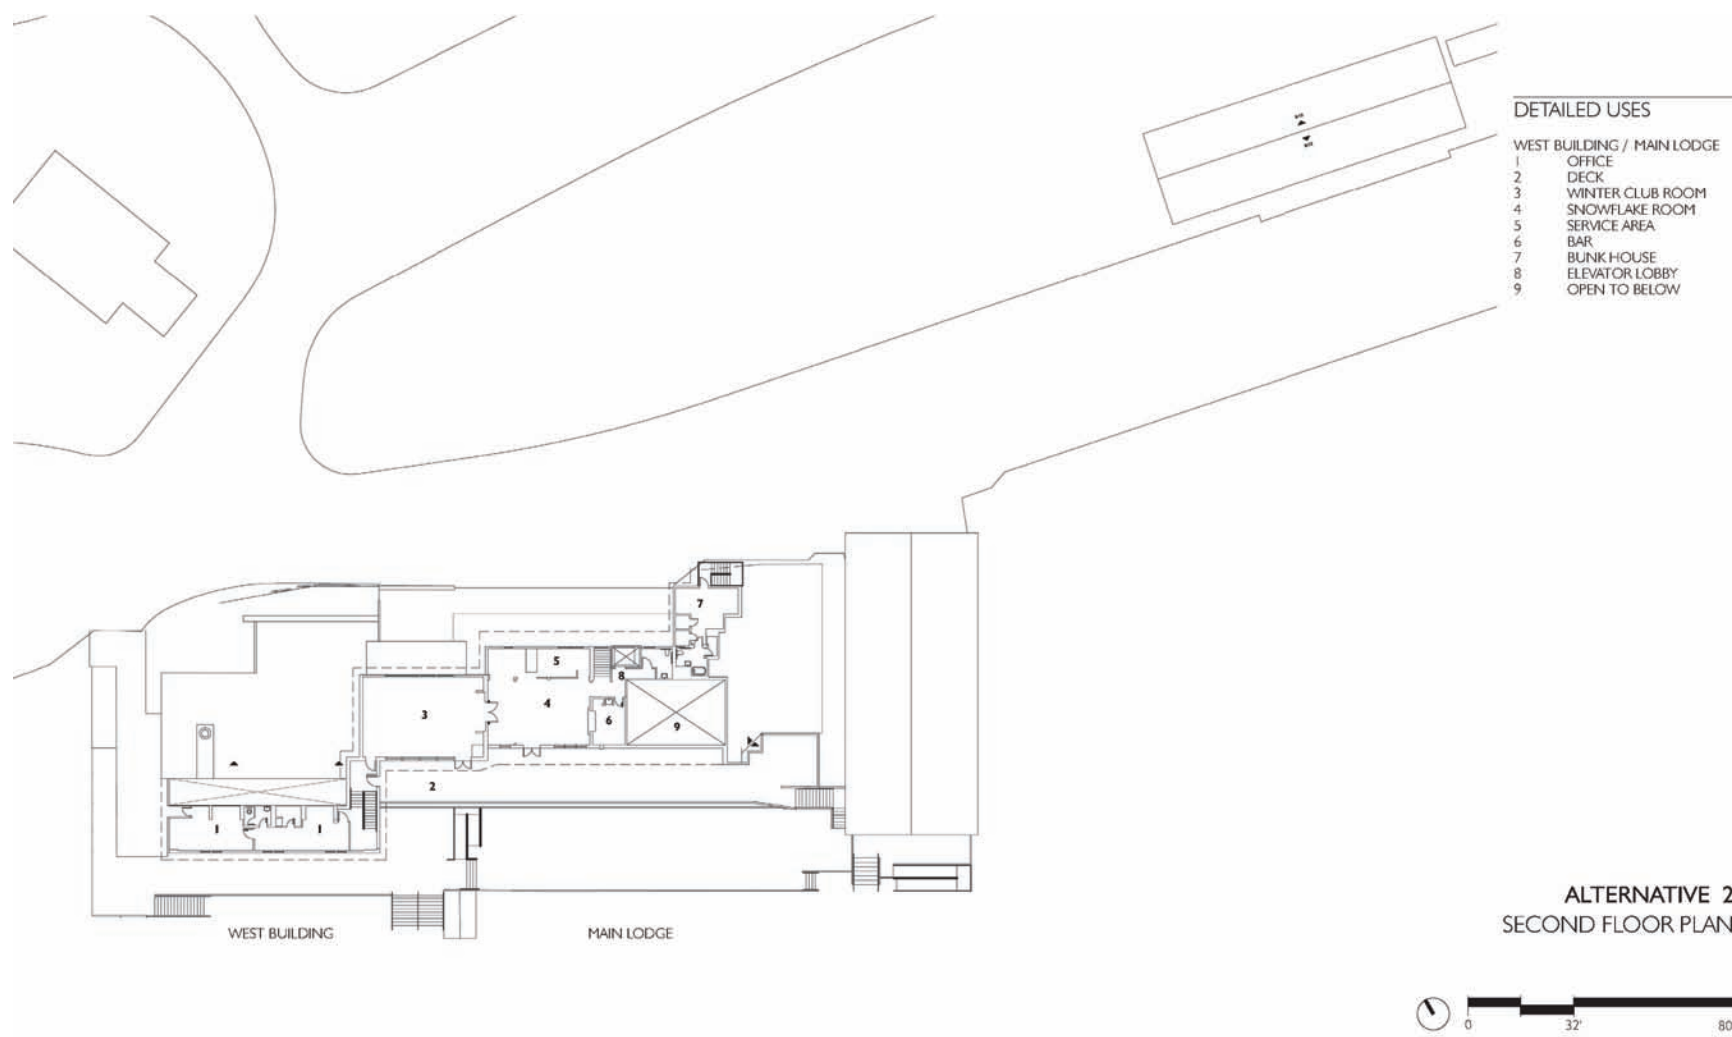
Badger Pass Ski Lodge – Alternative 2 Second Floor Plan.
